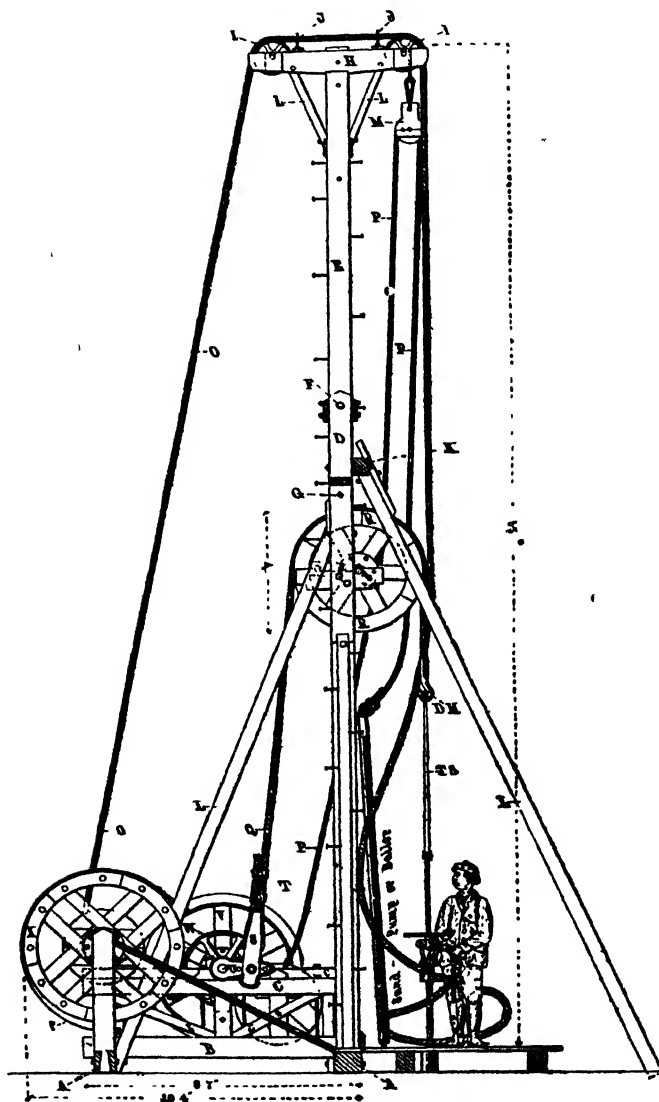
PORTABLE ROPE-BORING PLANT.
